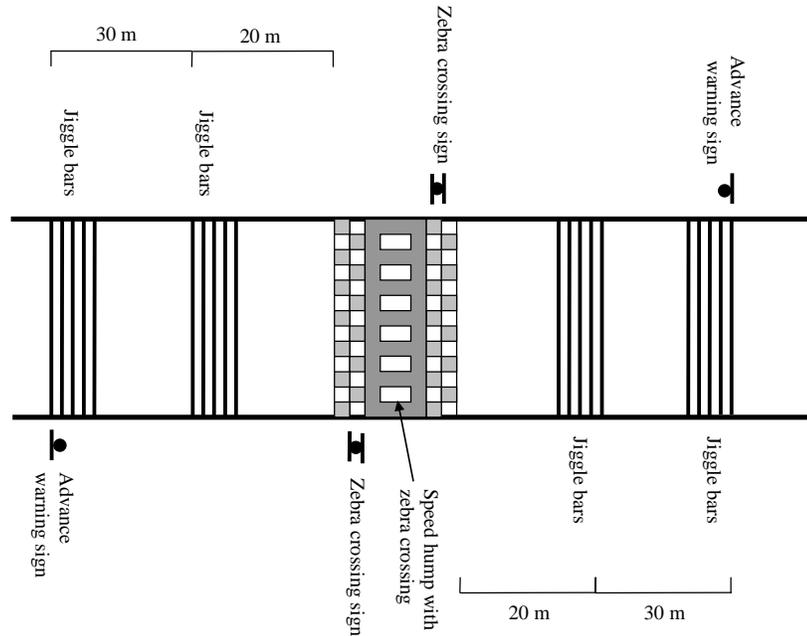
Example of a simple design plan for a zebra crossing on top of a trapezoidal hump.
